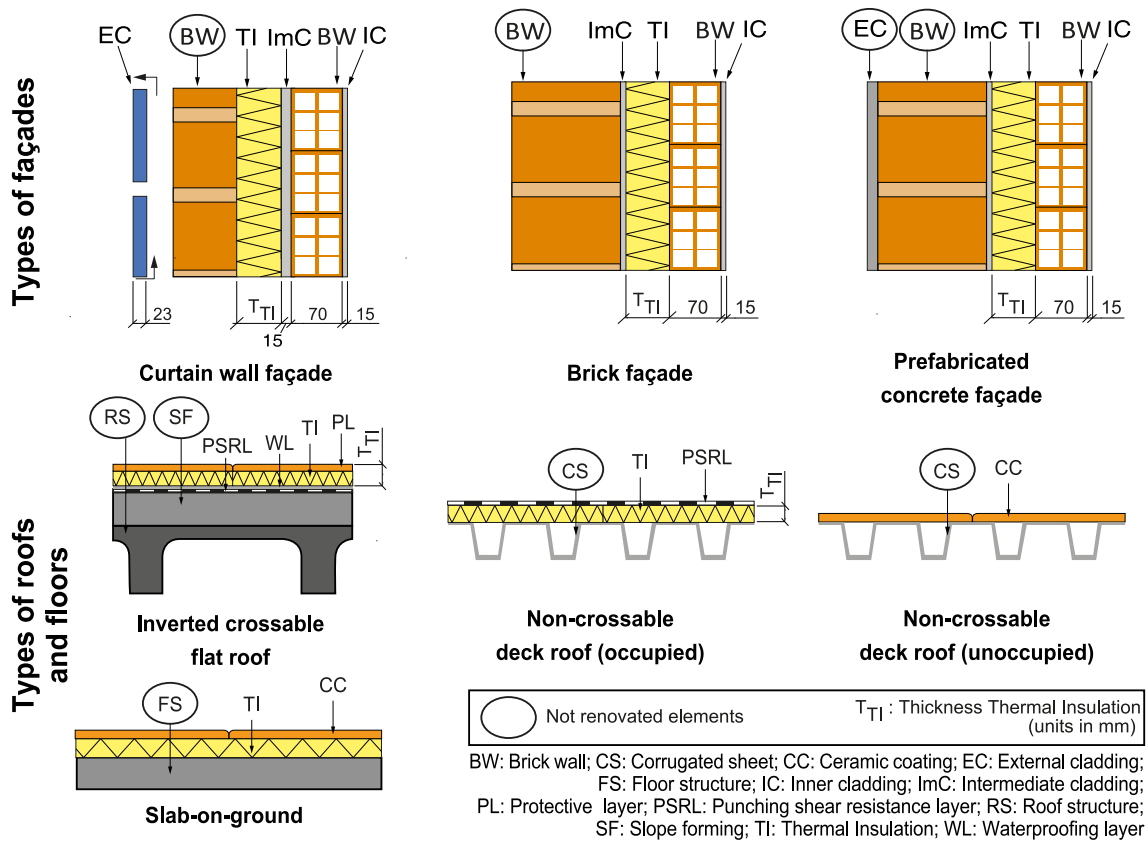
Constructive details of the types of façade, roofs and floors used in the renovation
